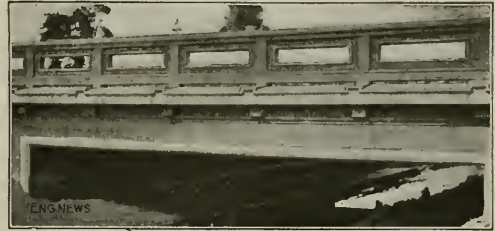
EXTERIOR FINISH OF THE PARK BRIDGE
